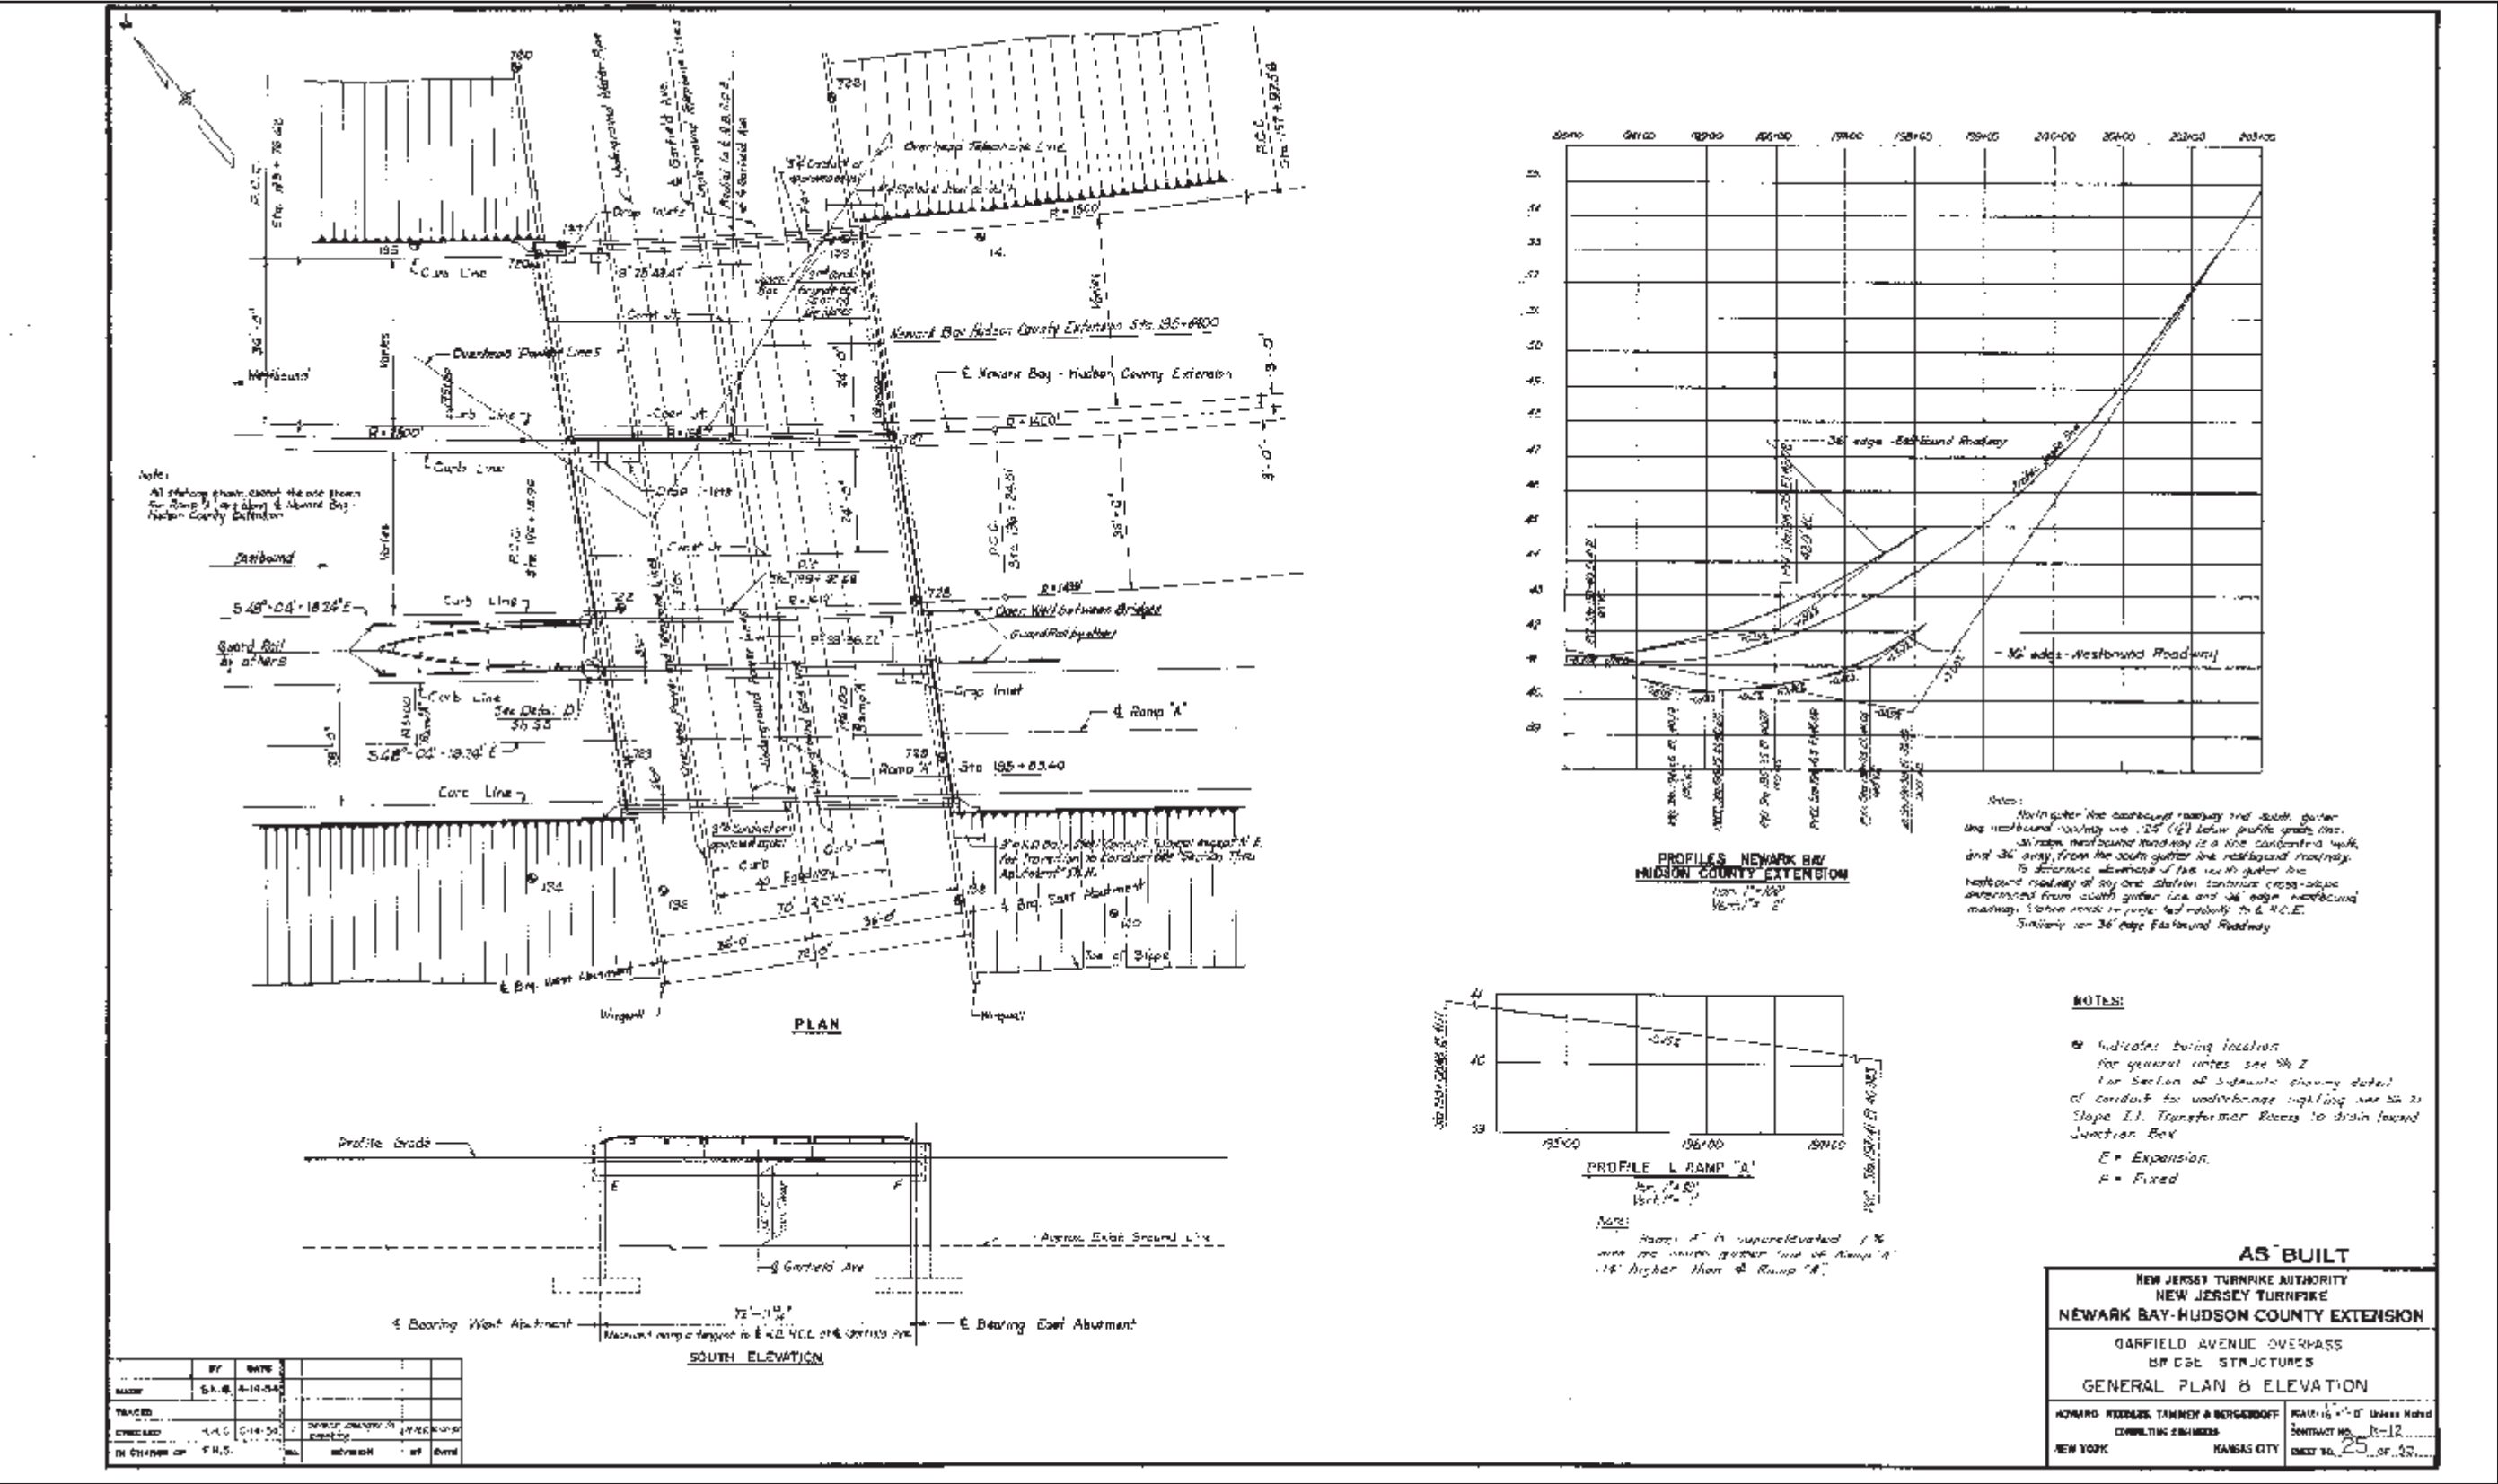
1954 as-built construction drawing showing the general plan and elevation of the Garfield Avenue Overpass (also known as the Bridge over Garfield Avenue) (HNTB 1954b).
